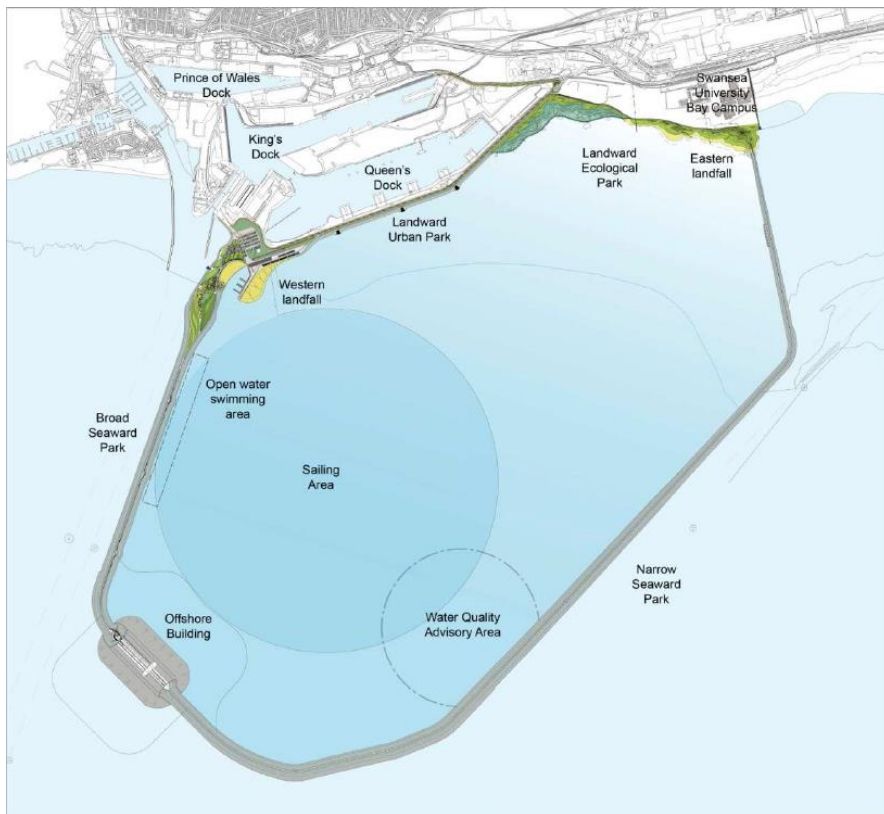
Swansea Bay Tidal Lagoon master plan (from the Applicant's ES).
